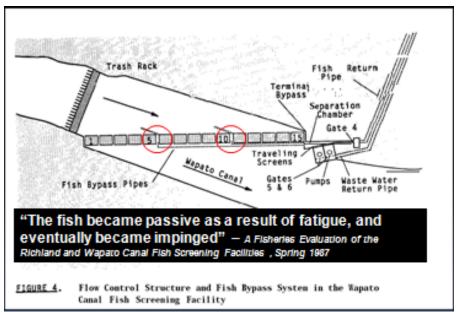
Wapato Dam Fish Screening Facility. Bypass pipes circled were not functioning
